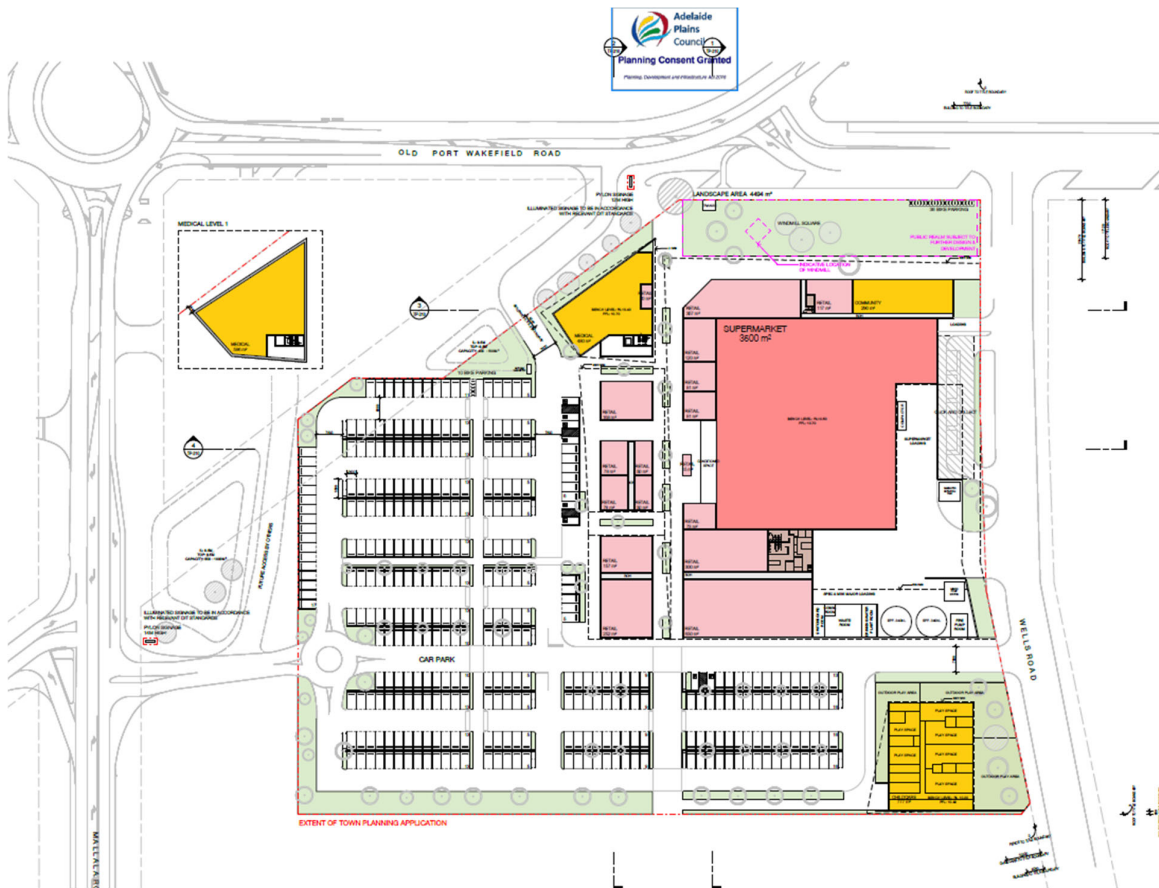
Concept Layout for DA 24040444 (Source: Leyton Property)
